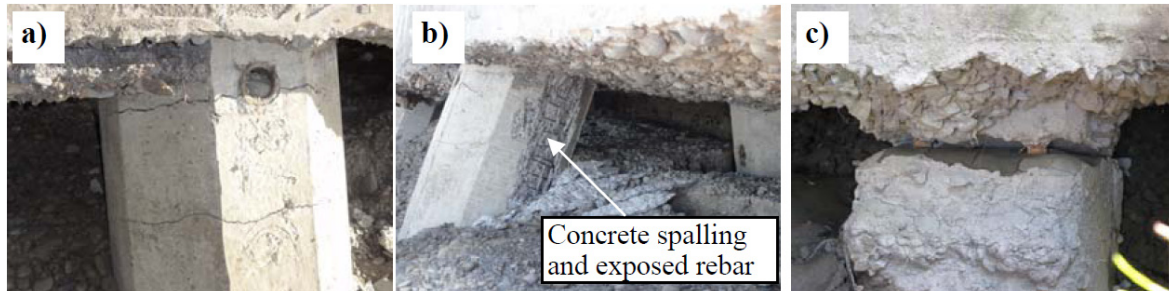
South Brighton Bridge: bending cracks at the top of abutment pile, on the river side (a) and concrete crushing on the land-side of abutment pile (b); Fitzgerald Bridge: failure of the northeast abutment pile (c)
